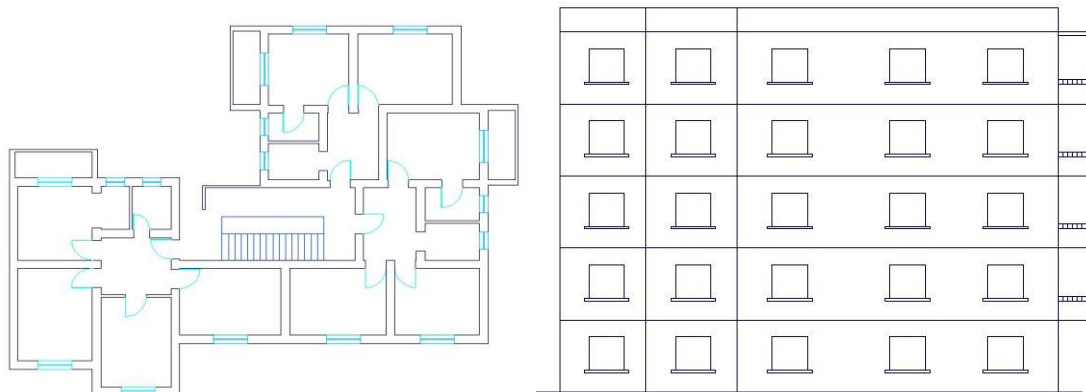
Template B4 plan and façade view [AQTN, 2018]
